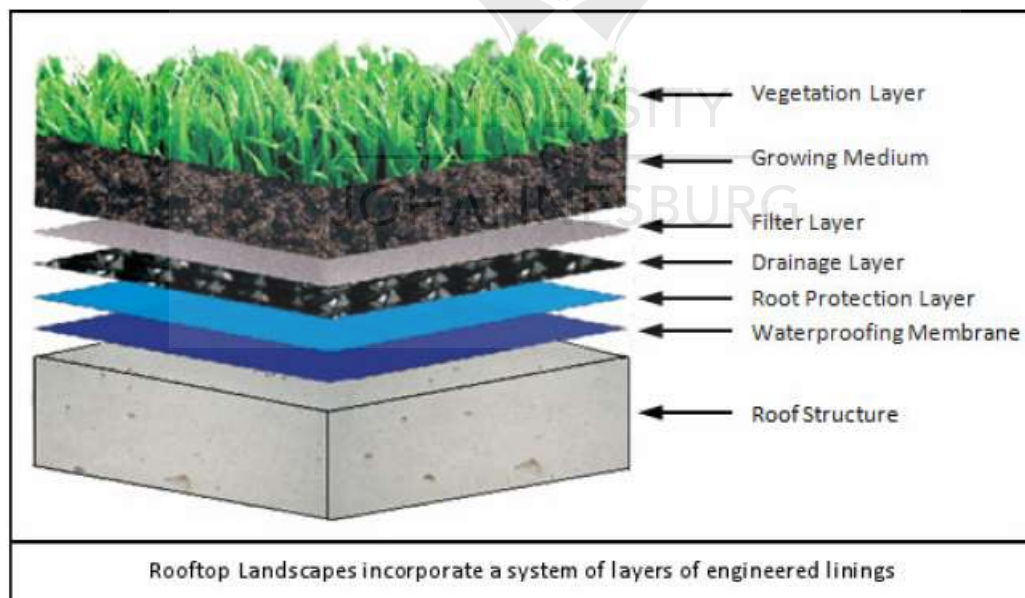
Cross section of the layers used in a typical Green Roof installation. Source: (Rooftop Landscapes, 2018)
